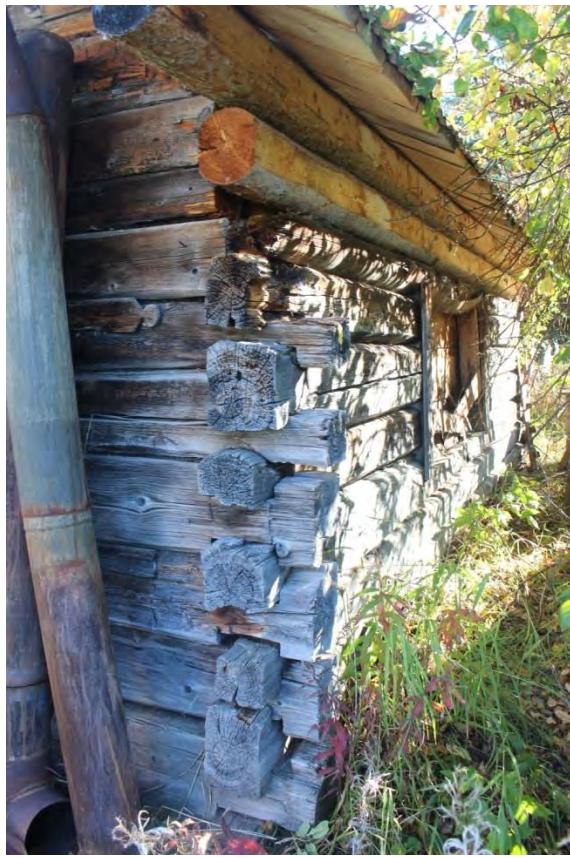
Lonny Johnny cabin with half lap corners extending from the walls, note the soil banked against bottom logs and new logs without appropriate notching below the roof.
